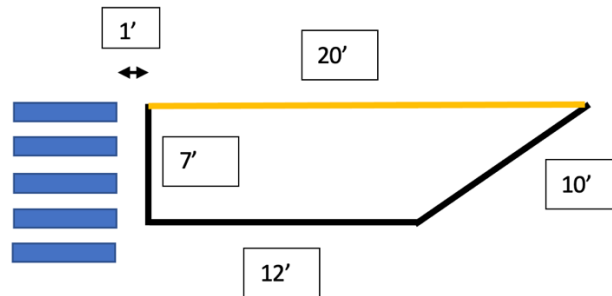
Sketch of curb extensions for Ousel Falls Road.
